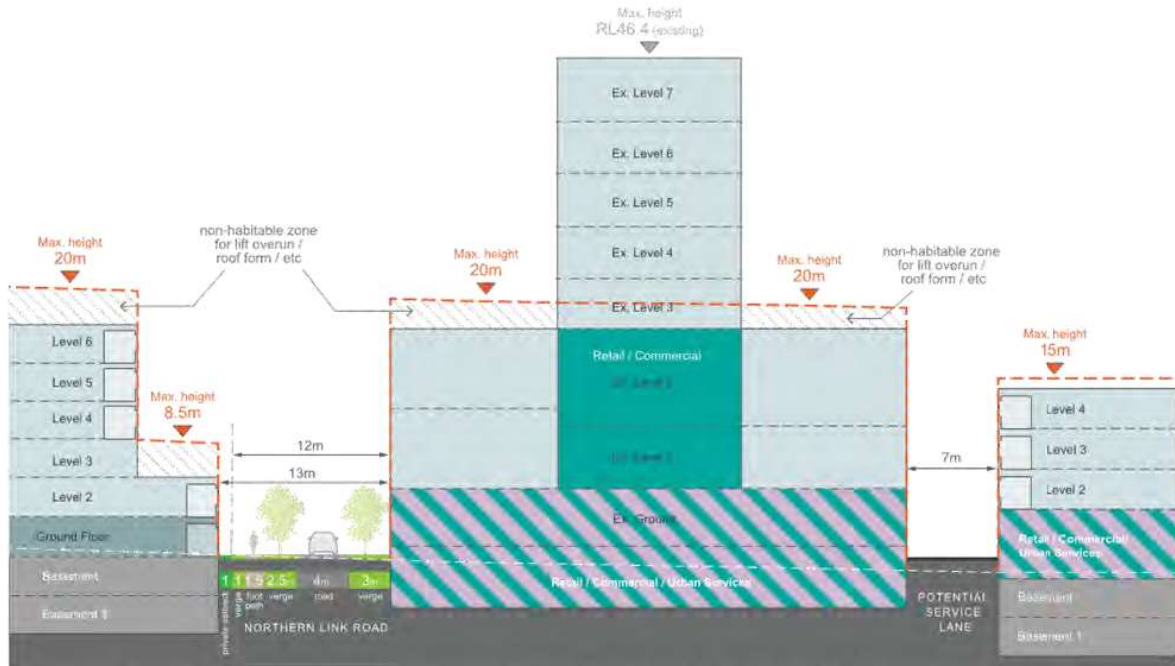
Section 5: Looking east towards 6 storey development, existing Central Roasting Hall and 4 storey development with indicative potential locations of urban service uses
